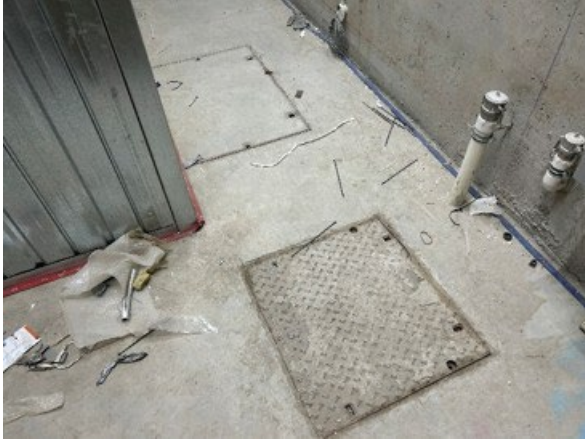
Lower Ground, Sewer Pump Station, 2 x unknown pits
